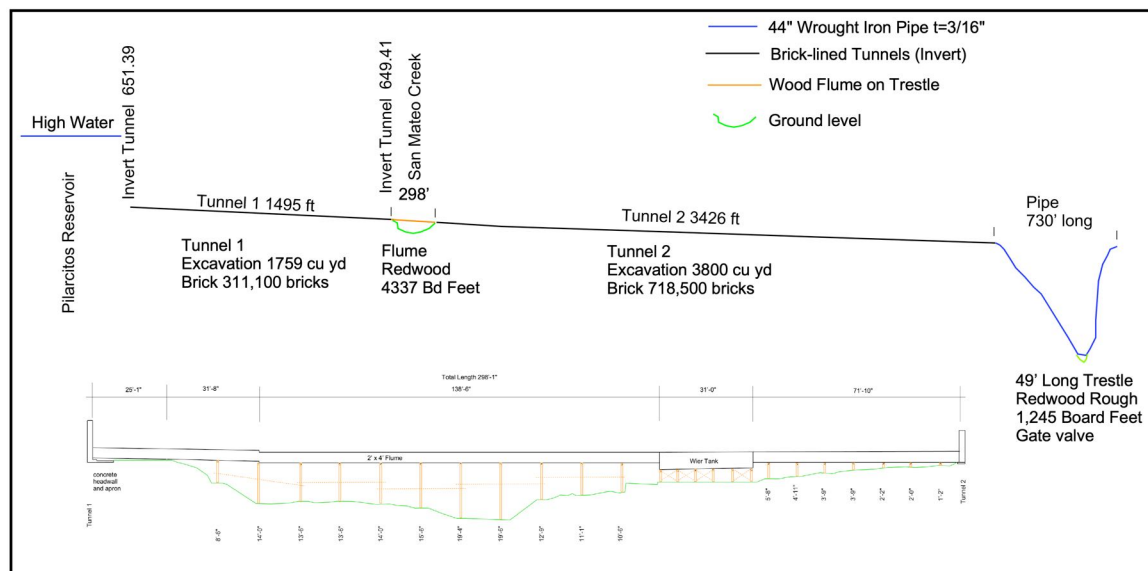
Pilarcitos Conduit: Tunnels 1 and 2, Flume Between Tunnels 1 and 2, 44" Pipe
